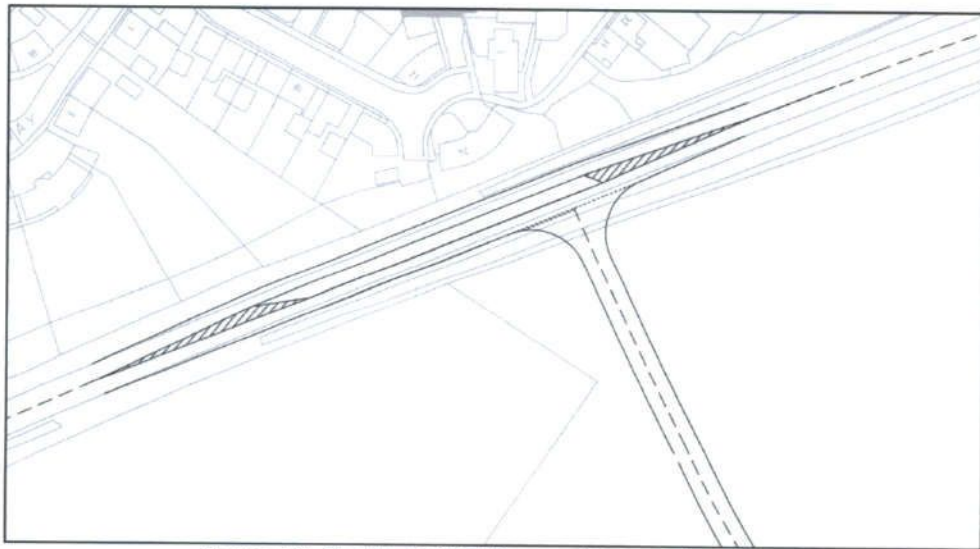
Sketch of A354 Proposed Access Arrangement
